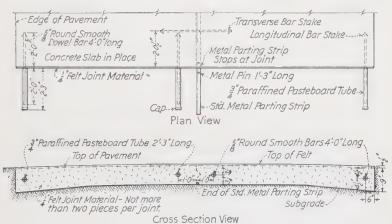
Transverse joint detail for standard concrete pavement—Wisconsin Highway Commission.
